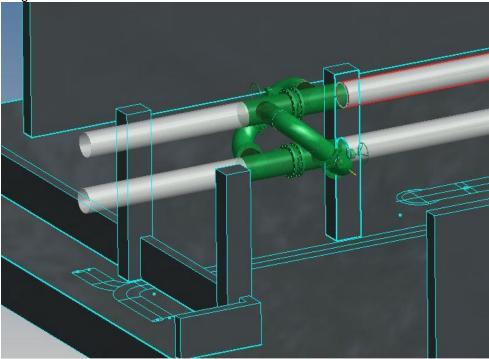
Drawing of crossover pipework (courtesy of Acciona)
